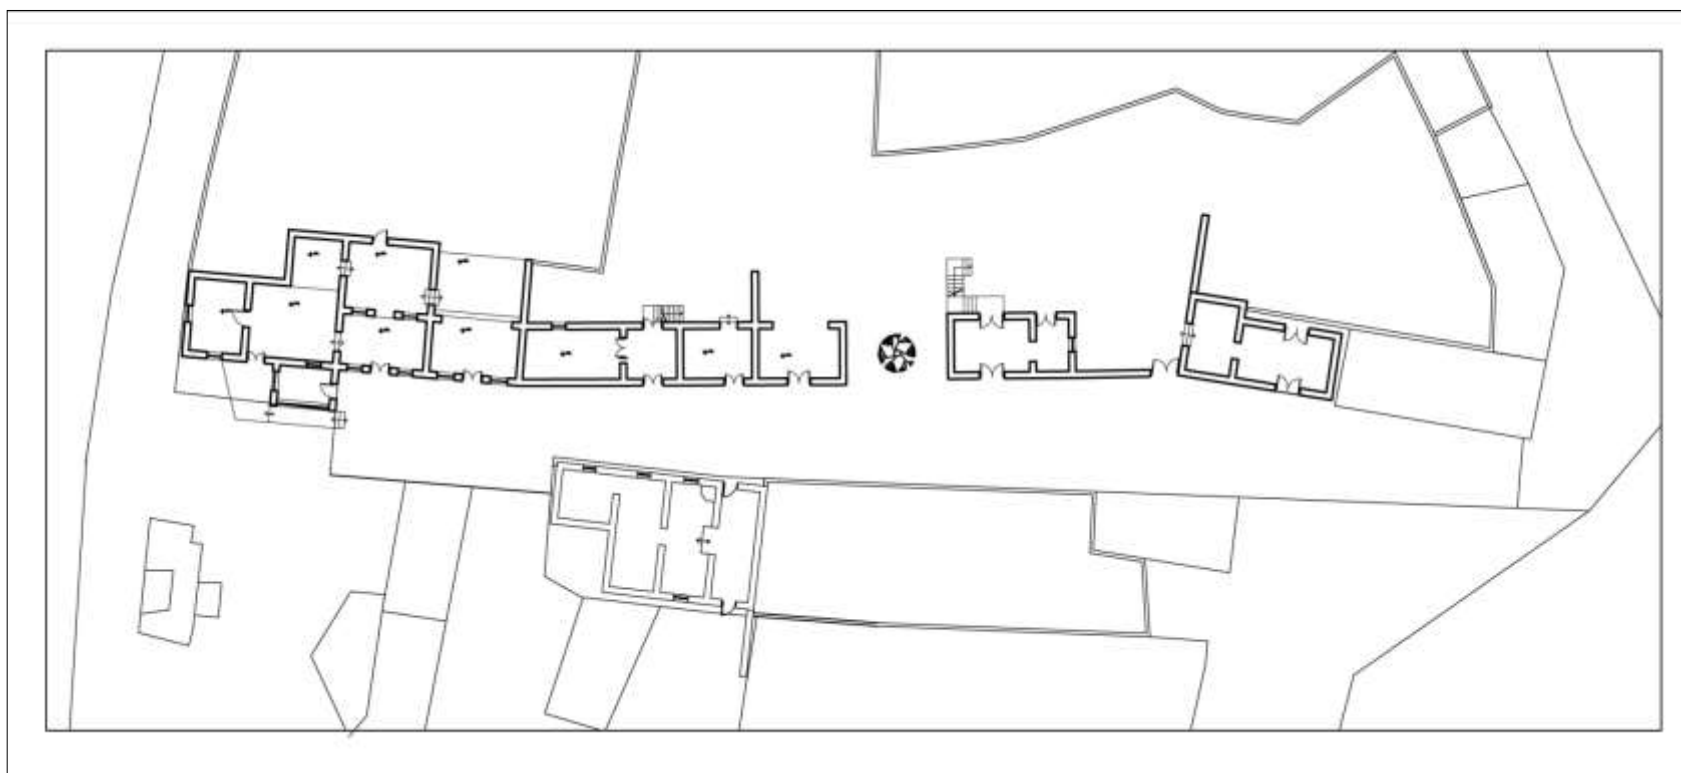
Veli Usta Street Ground Floor Plan
